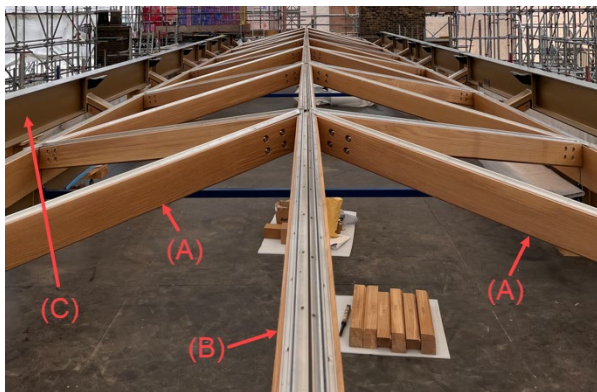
Combination of the solid timber and flitch beams. (A) Solid timber beams. (B) Flitch beams. (C) Steel beams.
